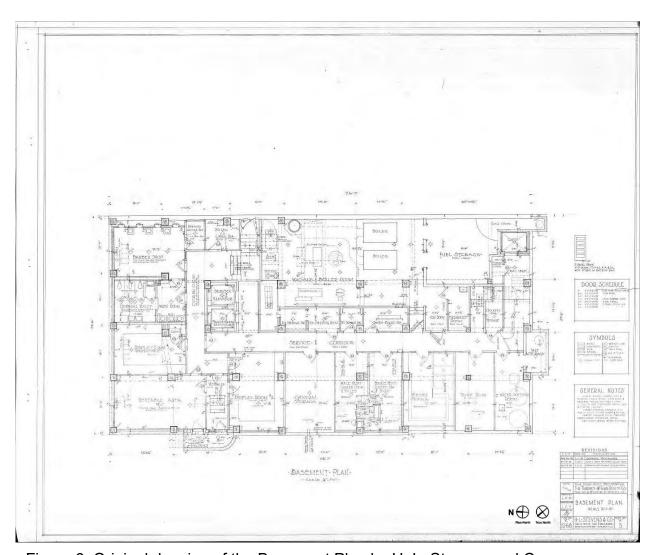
Original drawing of the Basement Plan by H. L. Stevens and Company, 1928. From the collection of the building's owner, available in the management office, Park Towers Apartments, Waterloo, Iowa.
